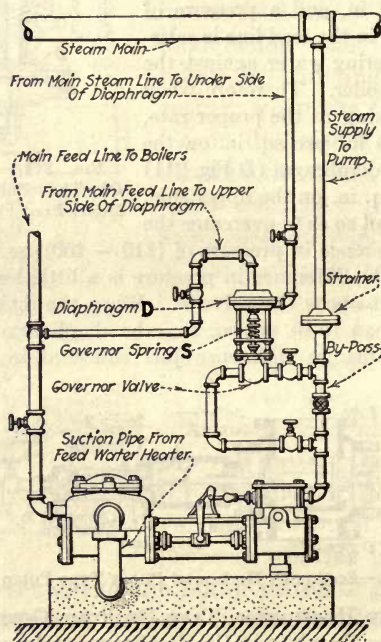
Direct-Acting Boiler Feed Pump Equipped With Kieley Governor.
